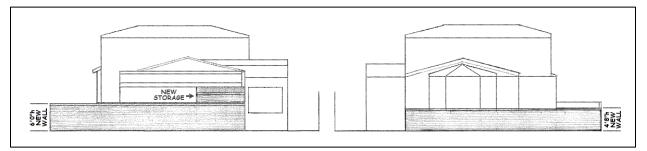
Elevations showing the proposed wall. The top right will be the elevation facing 22<sup>nd</sup> Ave NE.
